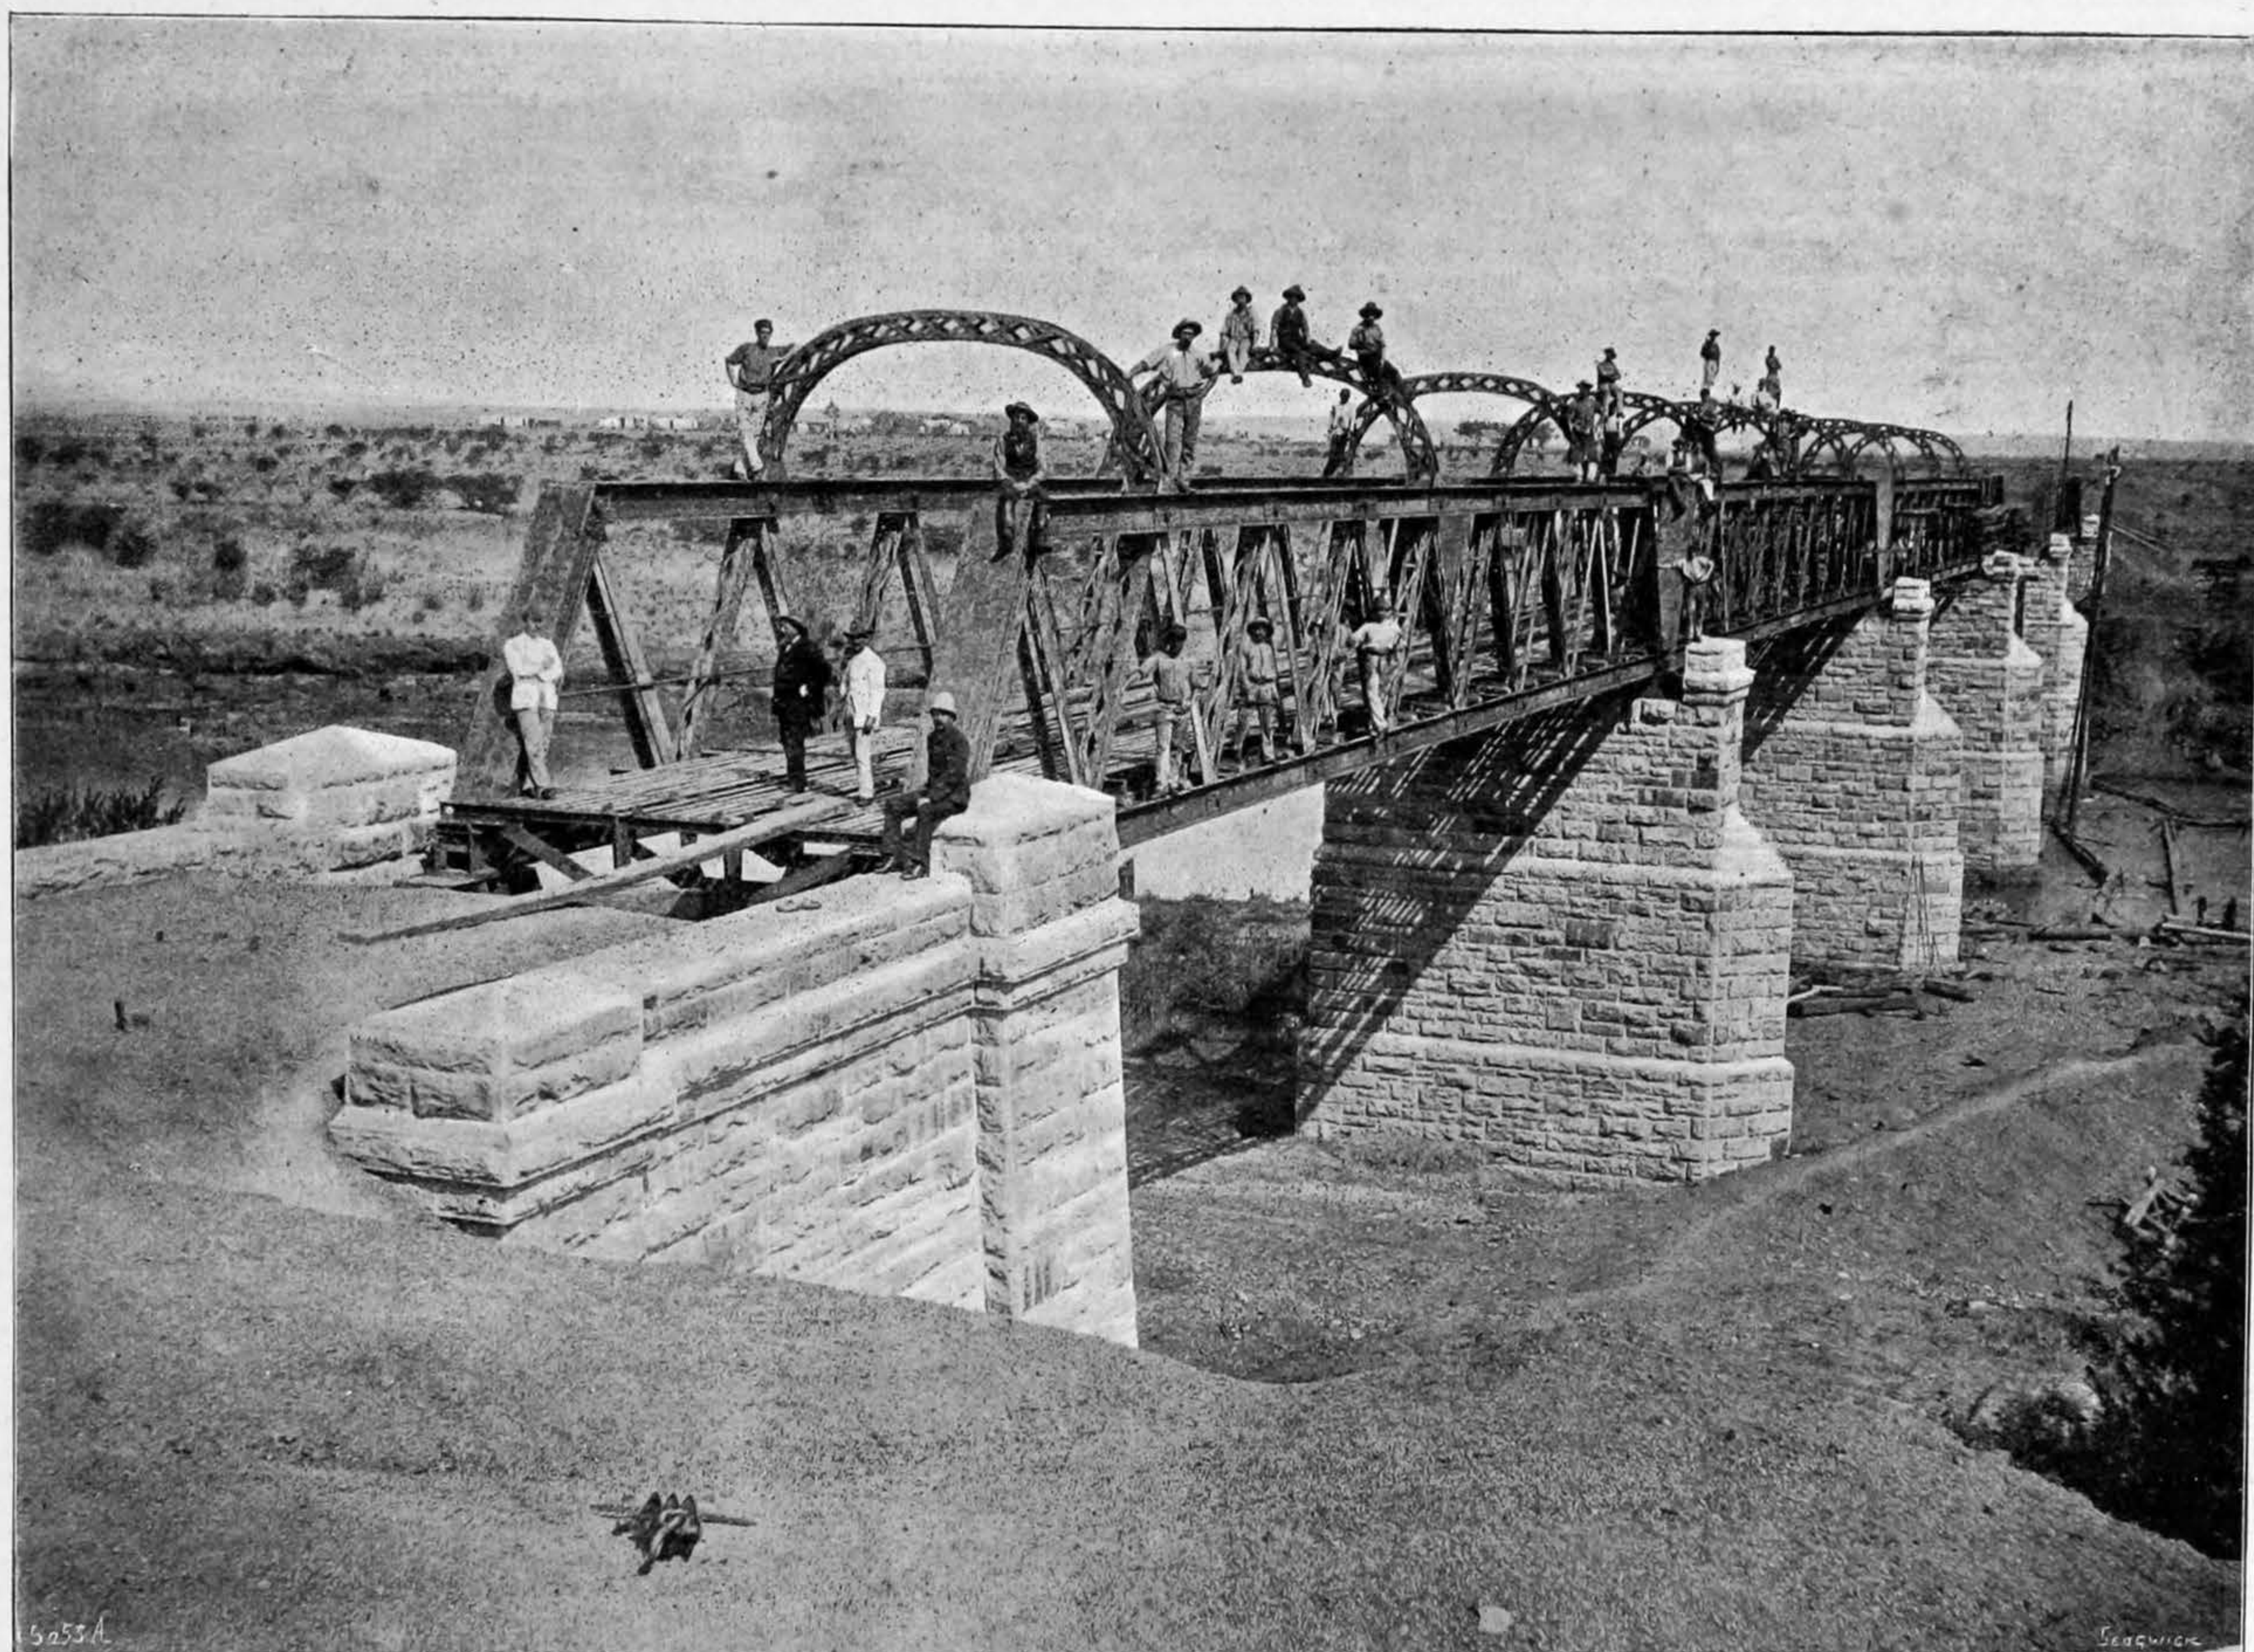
ORIGINAL RAILWAY BRIDGE AT COLENZO.
